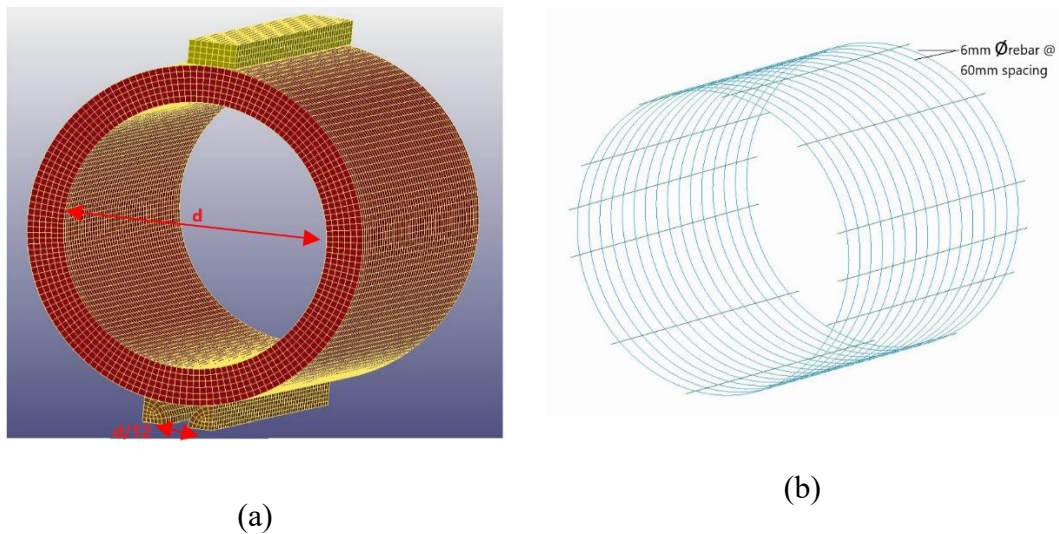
3D model of reinforced concrete pipe (a) solid element mesh for concrete material (b) single cage steel reinforcement bar in 825 mm diameter pipe
